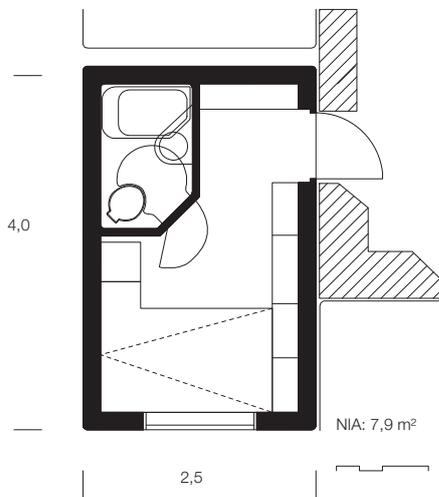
Nakagin Capsule Tower - floor plan capsule
